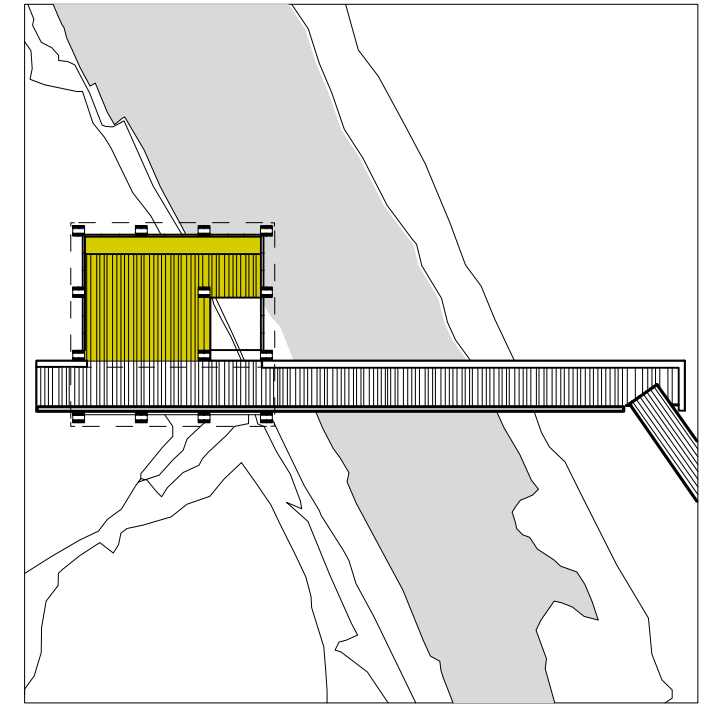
Floorplan with site context. Image by author from <https://www.archdaily.com/8726>.
